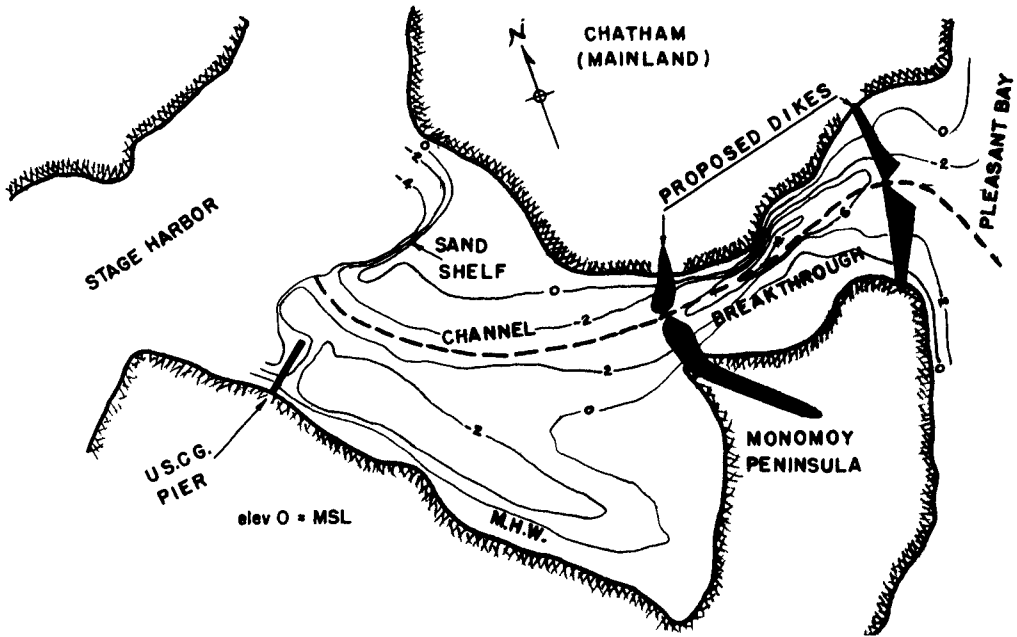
Schematic view of breakthrough showing location of proposed dikes.
